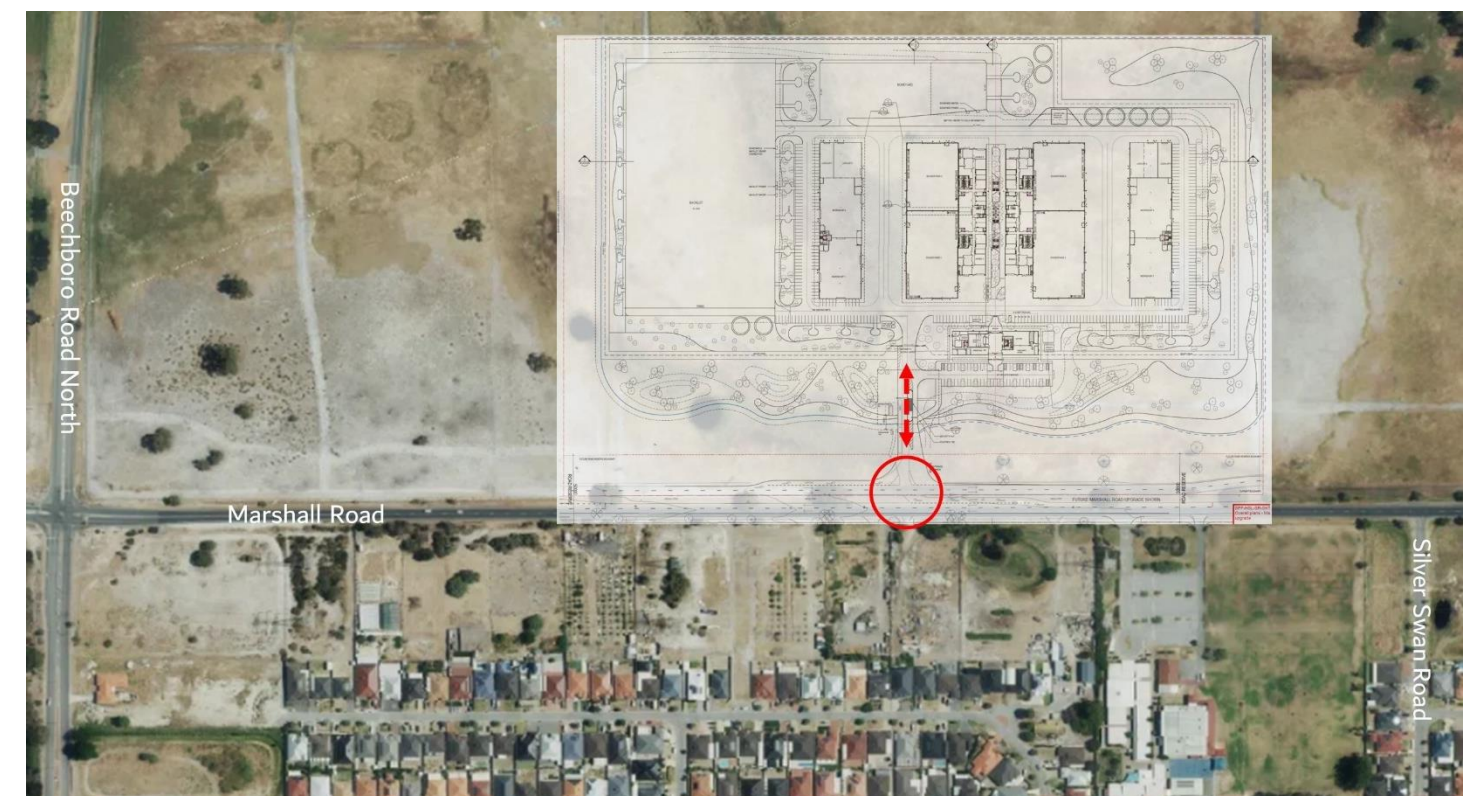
Location of the proposed combined Malaga Site entry and exit road on Marshall Road (source: Hassell, January 2023)
